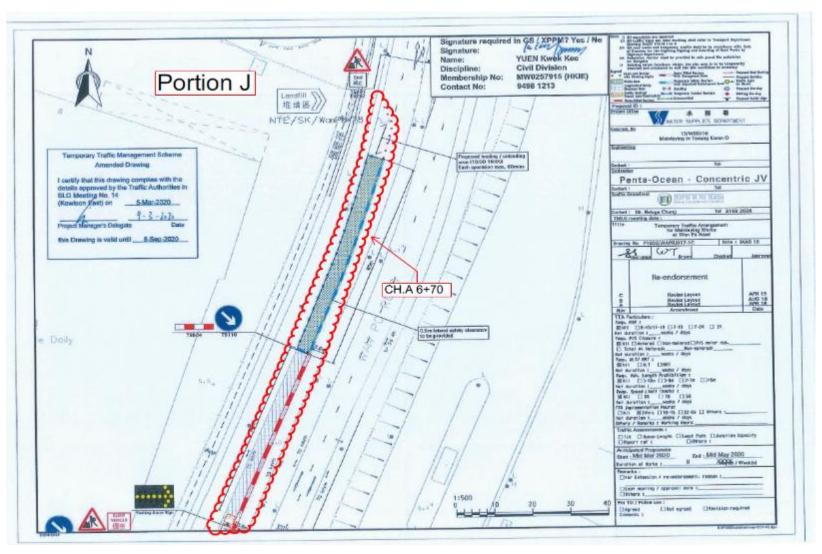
(i). Location Plan for Portion J - CH.A 6+70
